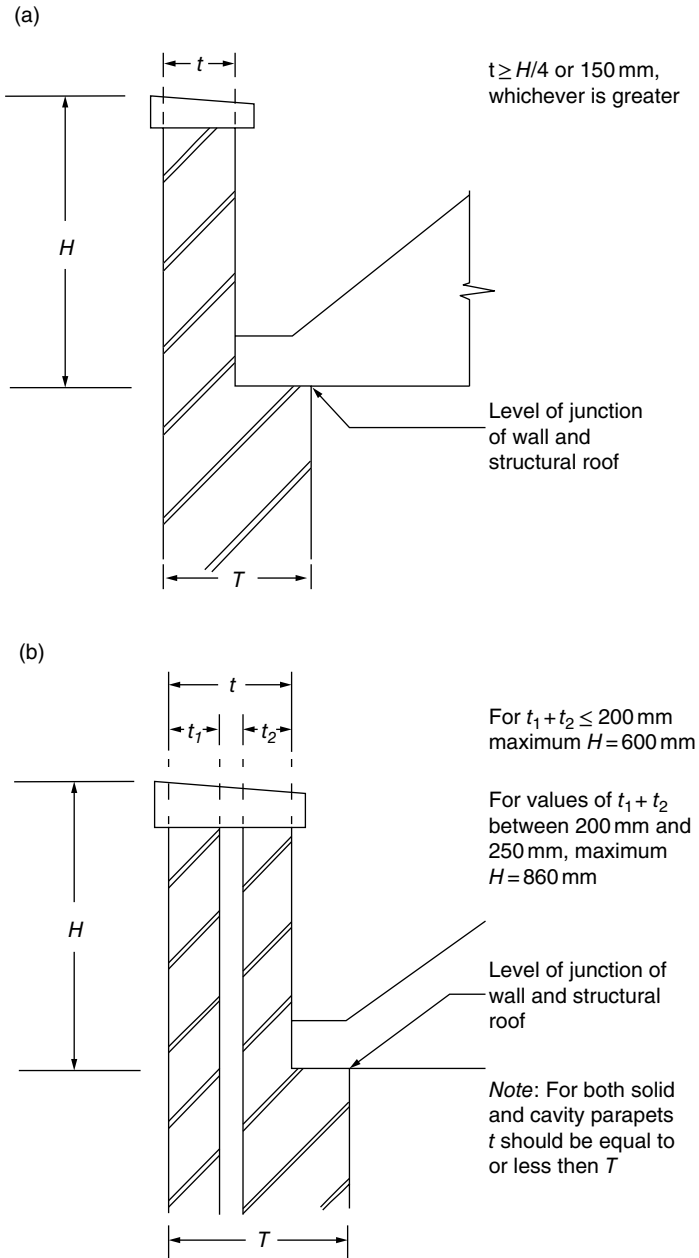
Height of parapet walls: (a) solid parapet walls and (b) cavity parapet walls.
